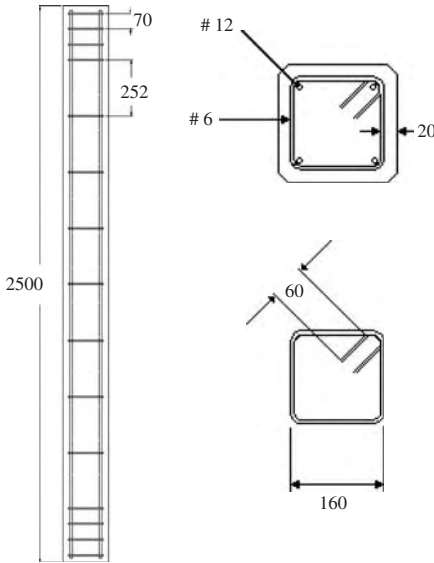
Reinforcement details of tested columns (dimensions in mm).
